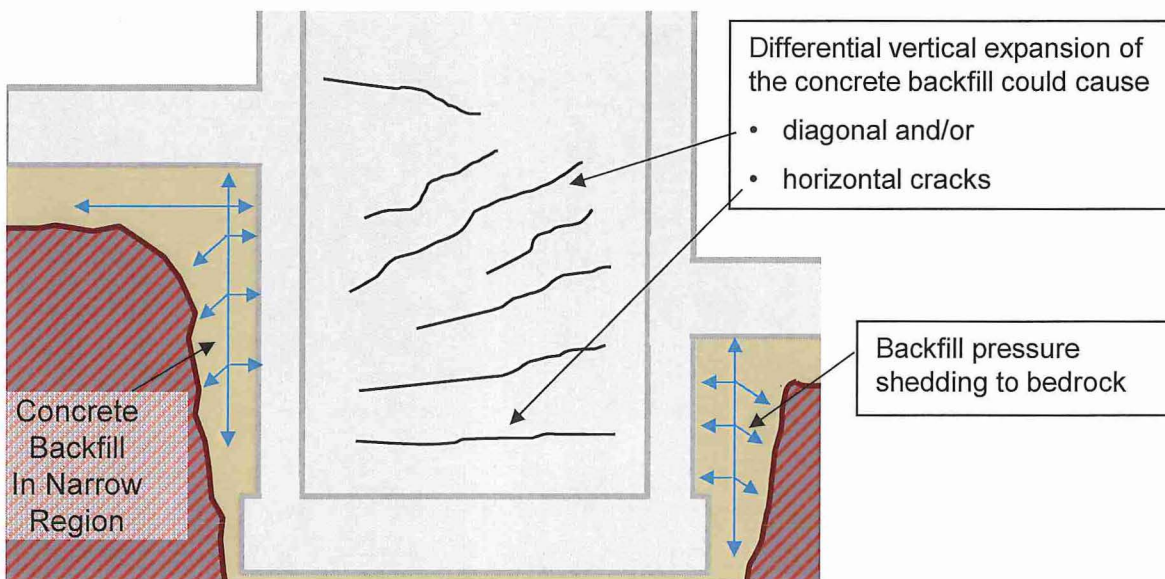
Structural Cracks due to Differential ASR Expansion in the Structure.
